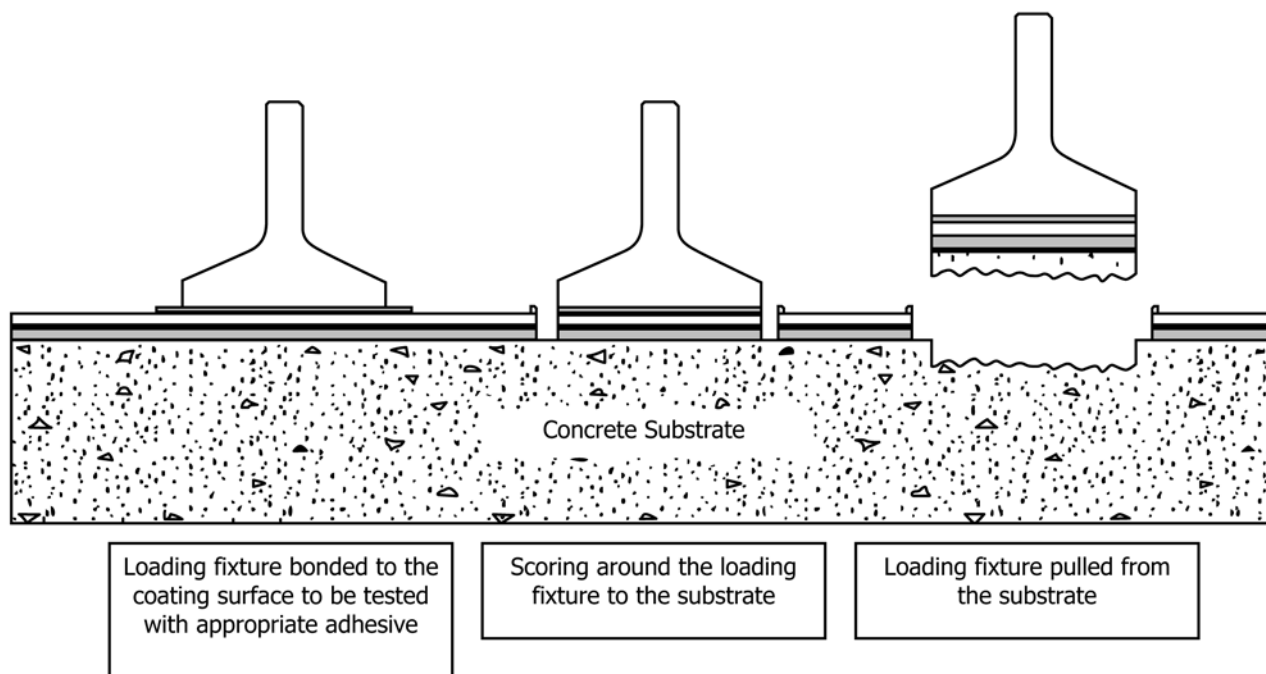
Scoring Around the Loading Fixture After Attachment of the Fixture (Square or Rectangular Fixtures)
